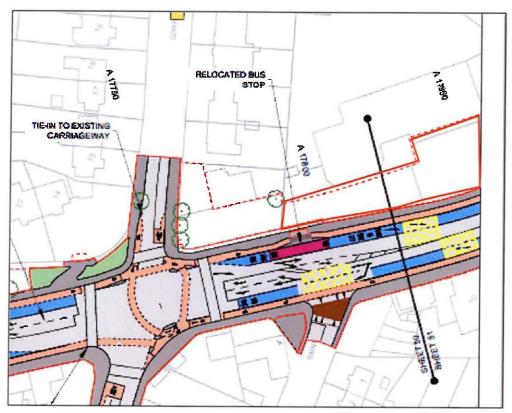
Scheme Plan for Bray, subject site generally outlined in red - West Side - (Source: Jacobs, 2023).
